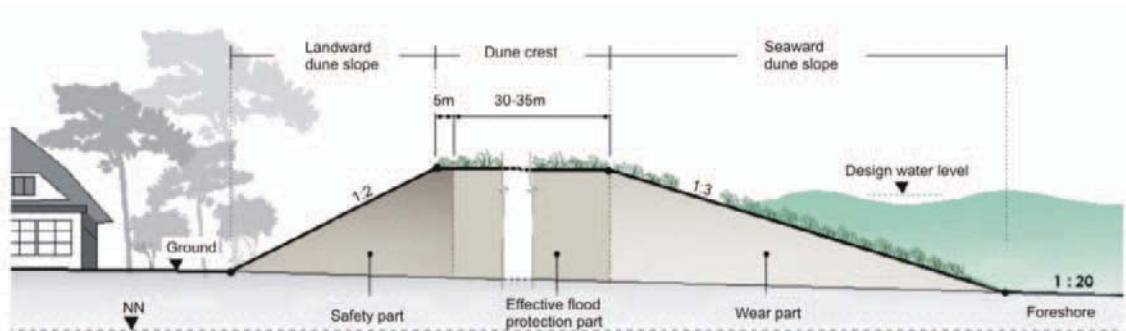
Cross section of a flood protection dune (after StALU 2009)
